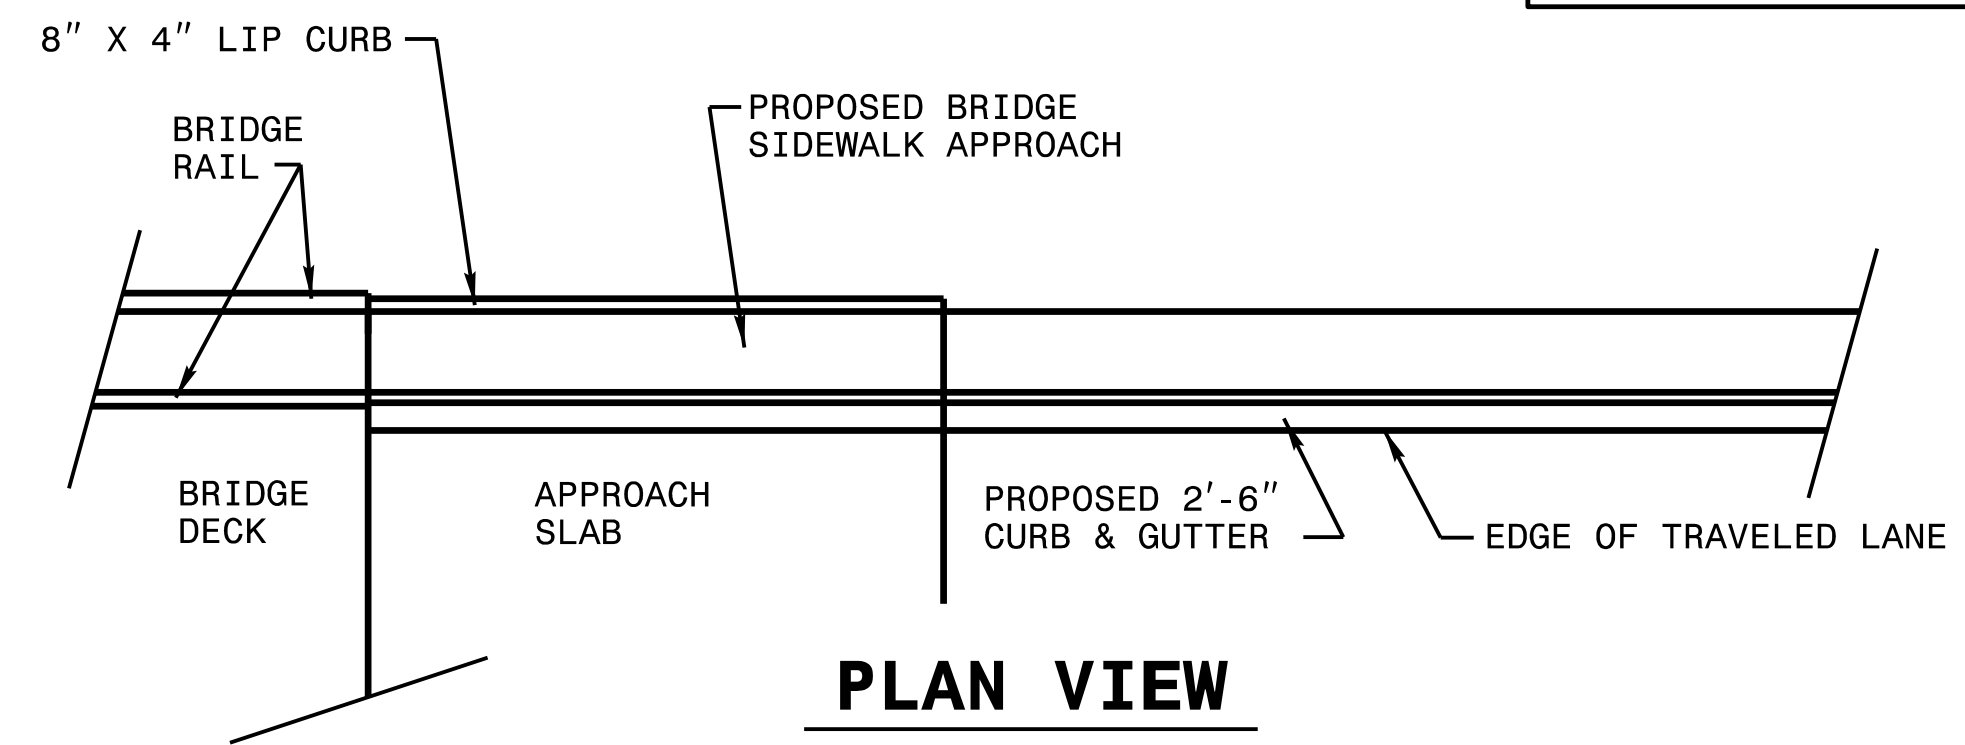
DETAIL OF PROPOSED CONCRETE BRIDGE SIDEWALK APPROACH
